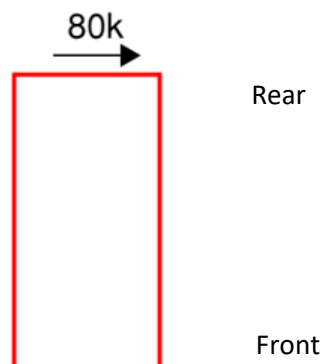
Retrofit Situation 3 before retrofit showing URM wall demand at rear transverse wall.
